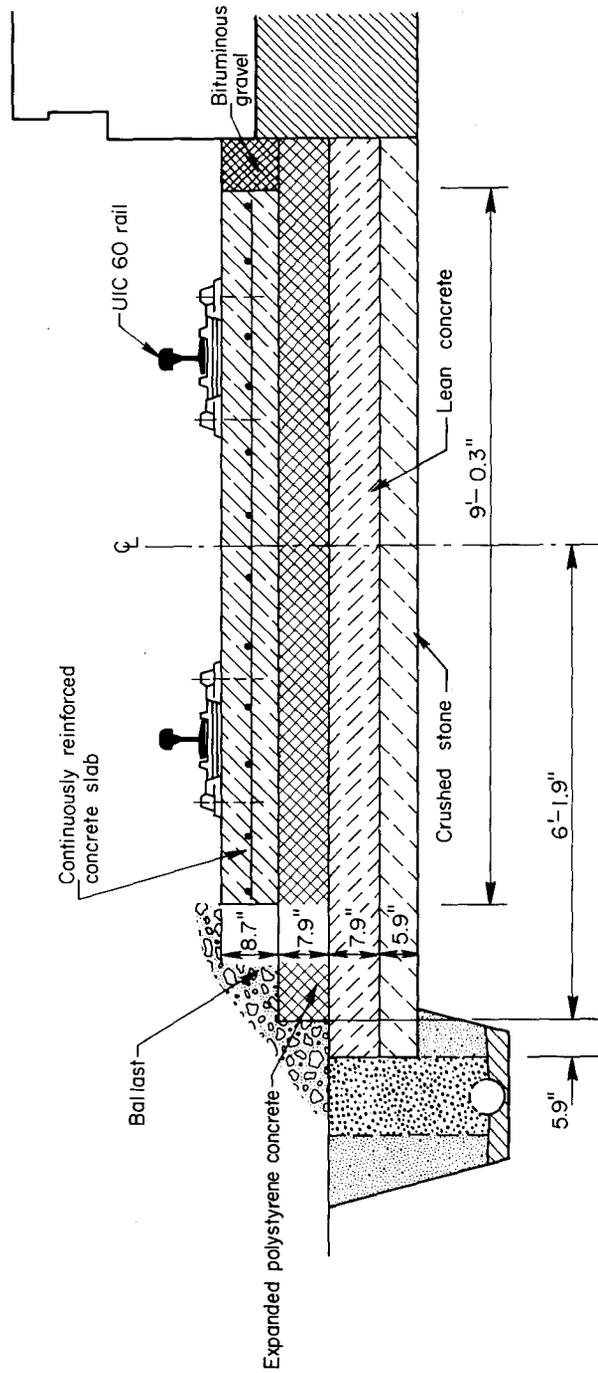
CROSS SECTION OF SLAB TRACK AT OELDE
